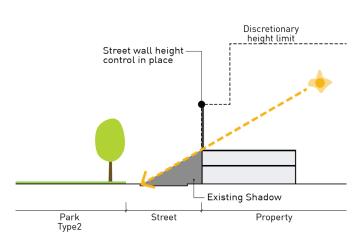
Park Type 2 (Street Wall) – Example of a shadow cast by an existing building (diagram only - not a specific location). A discretionary height control that is much taller than the existing building height applies.
